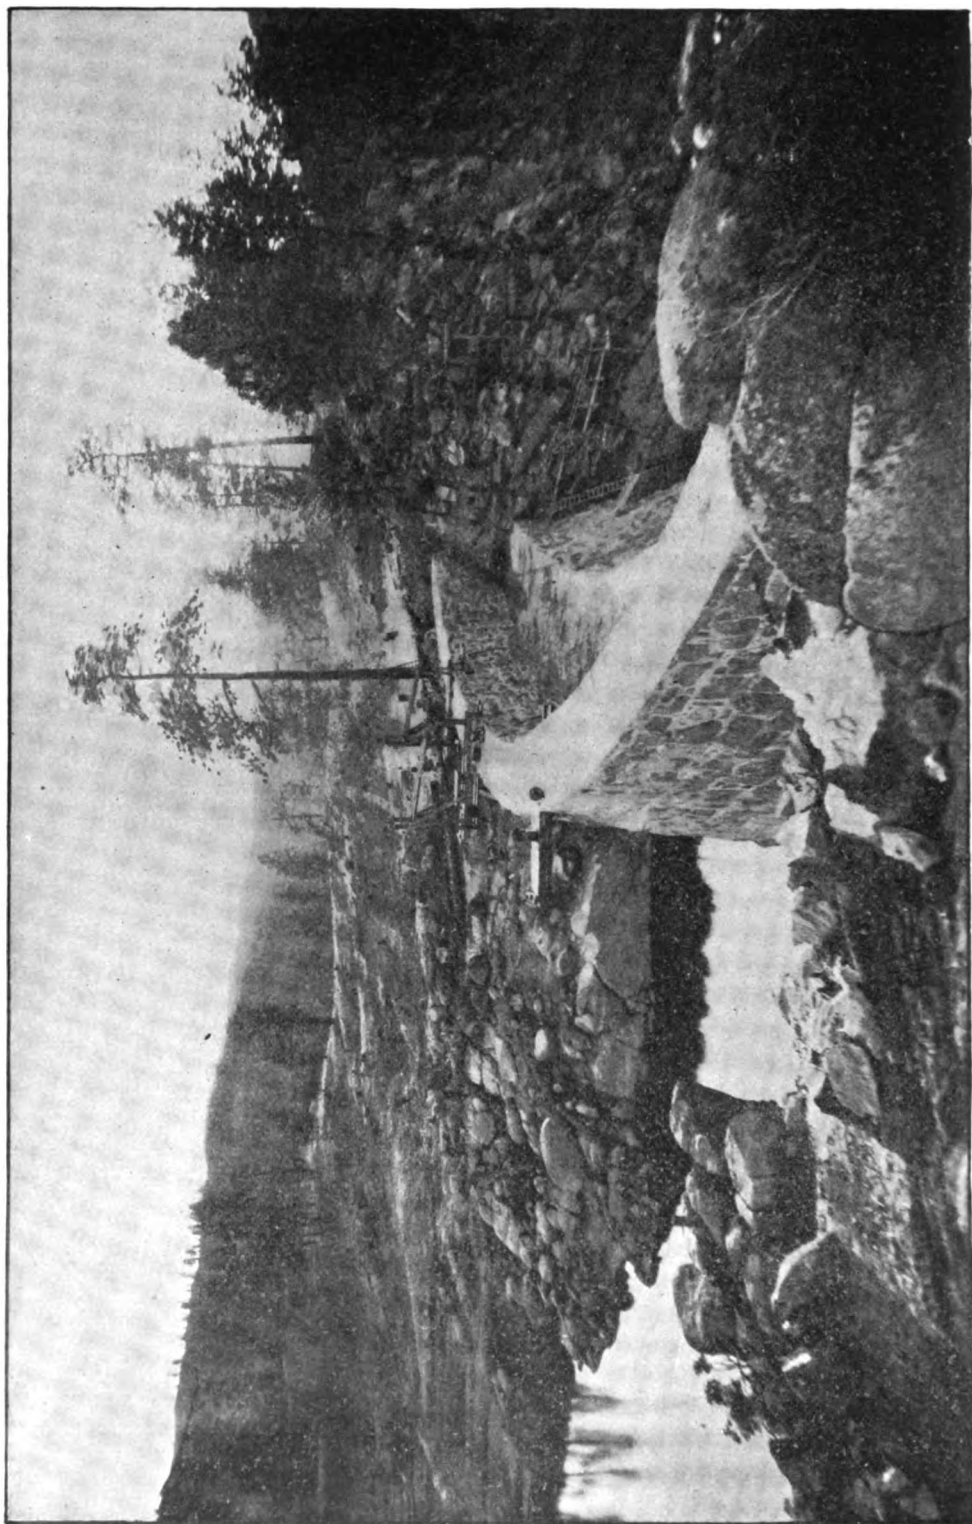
HEMET DAM AS FINISHED, SHOWING THE SPILLWAY RIDGE SOUTH OF THE DAM.
